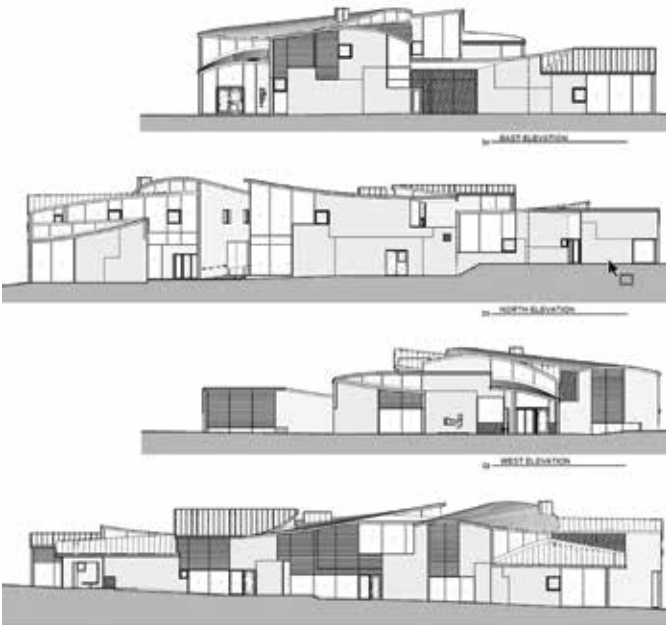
Building elevations of Rubenstein Commons (illustration courtesy of Steven Holl Architects)
